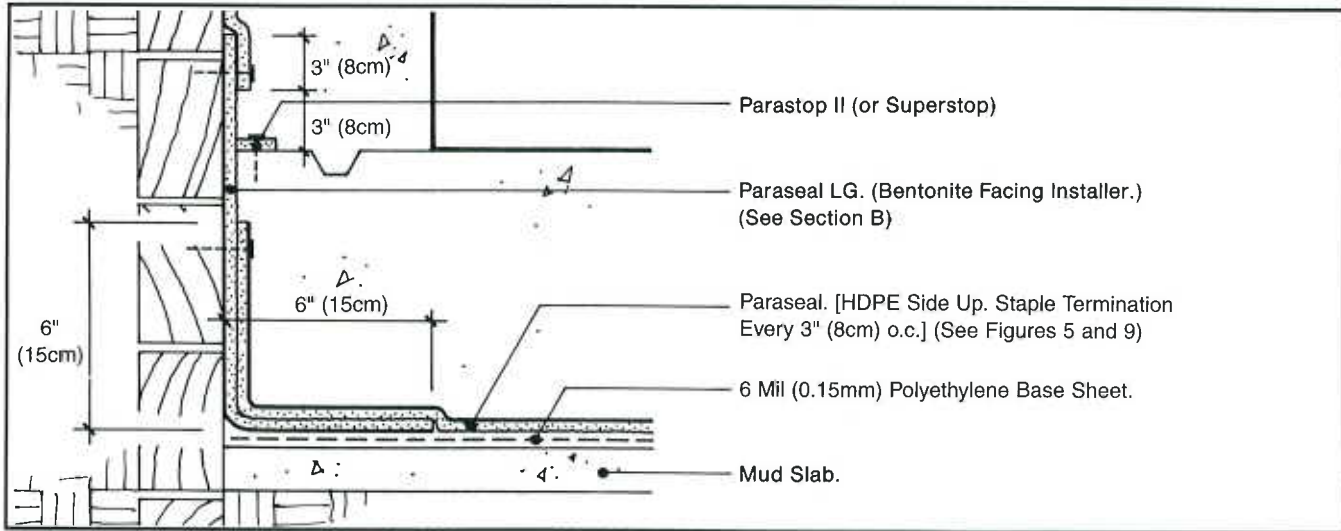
Tie-In Between Blindside Wall/Footing and Floor.
